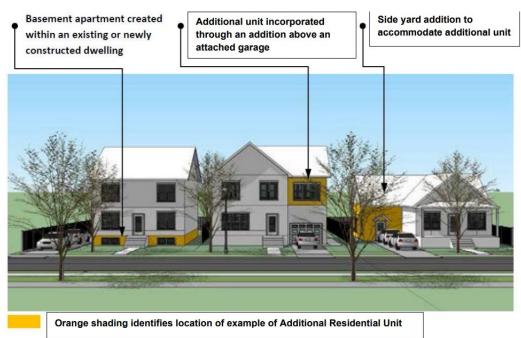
ARU locations within buildings (source: East Nipissing Official Plan)
